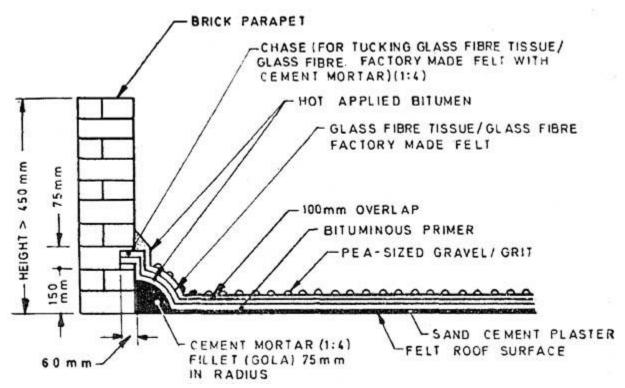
Waterproofing on a Flat Roof with Brick Parapet Over 450 mm in Height-Typical Details
